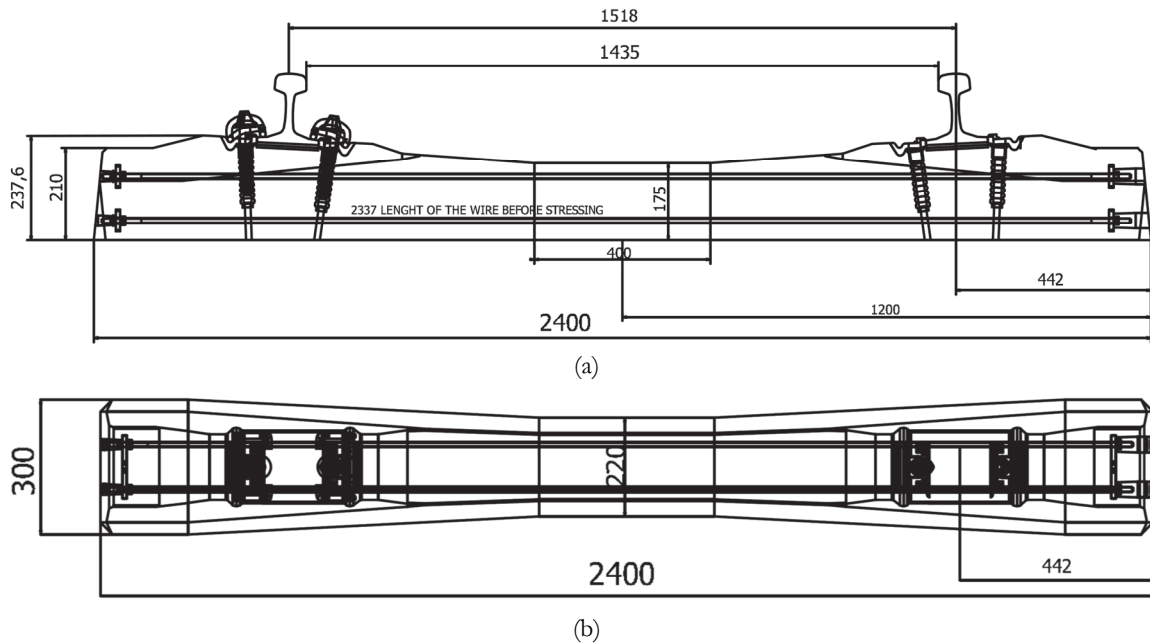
Geometrical dimension of mono-block sleeper B70 (unit: mm): (a) front view; (b) top view.
